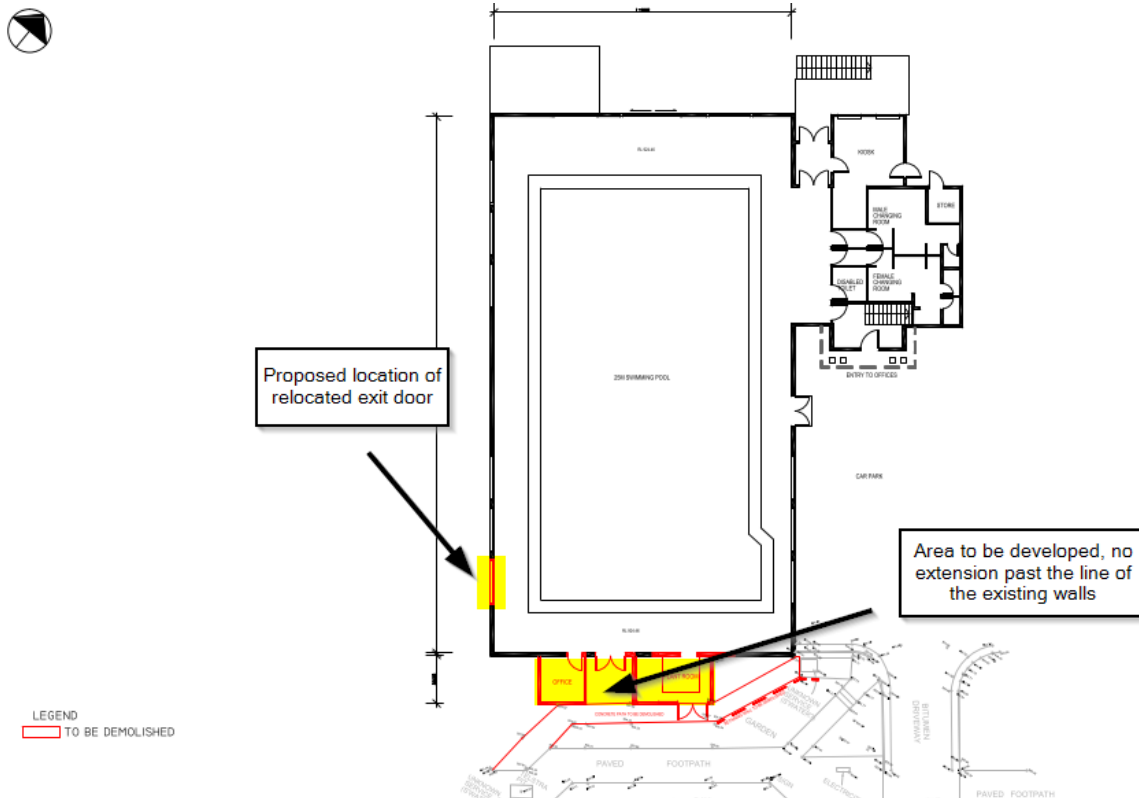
Areas of proposed works on existing building including location of parts of the building proposed to be demolished (office/storeroom/plant room)
